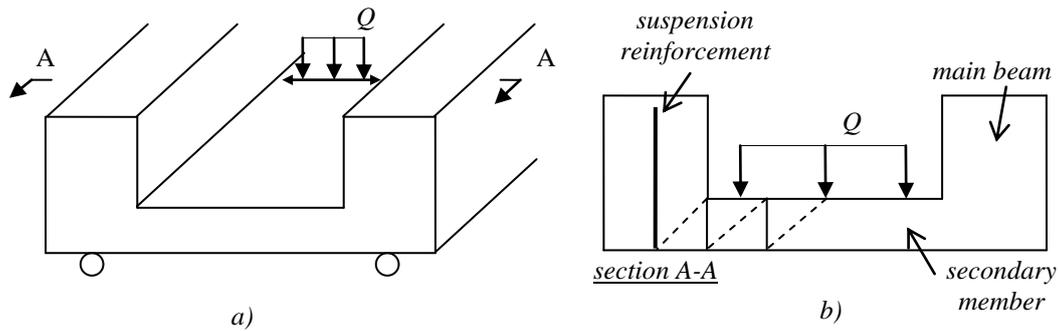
Through bridge loaded by a distributed load, Q , a) overview, b) section A-A illustrates how the load is resisted in the secondary member and lifted to the main beam where the load path continues to the supports.
